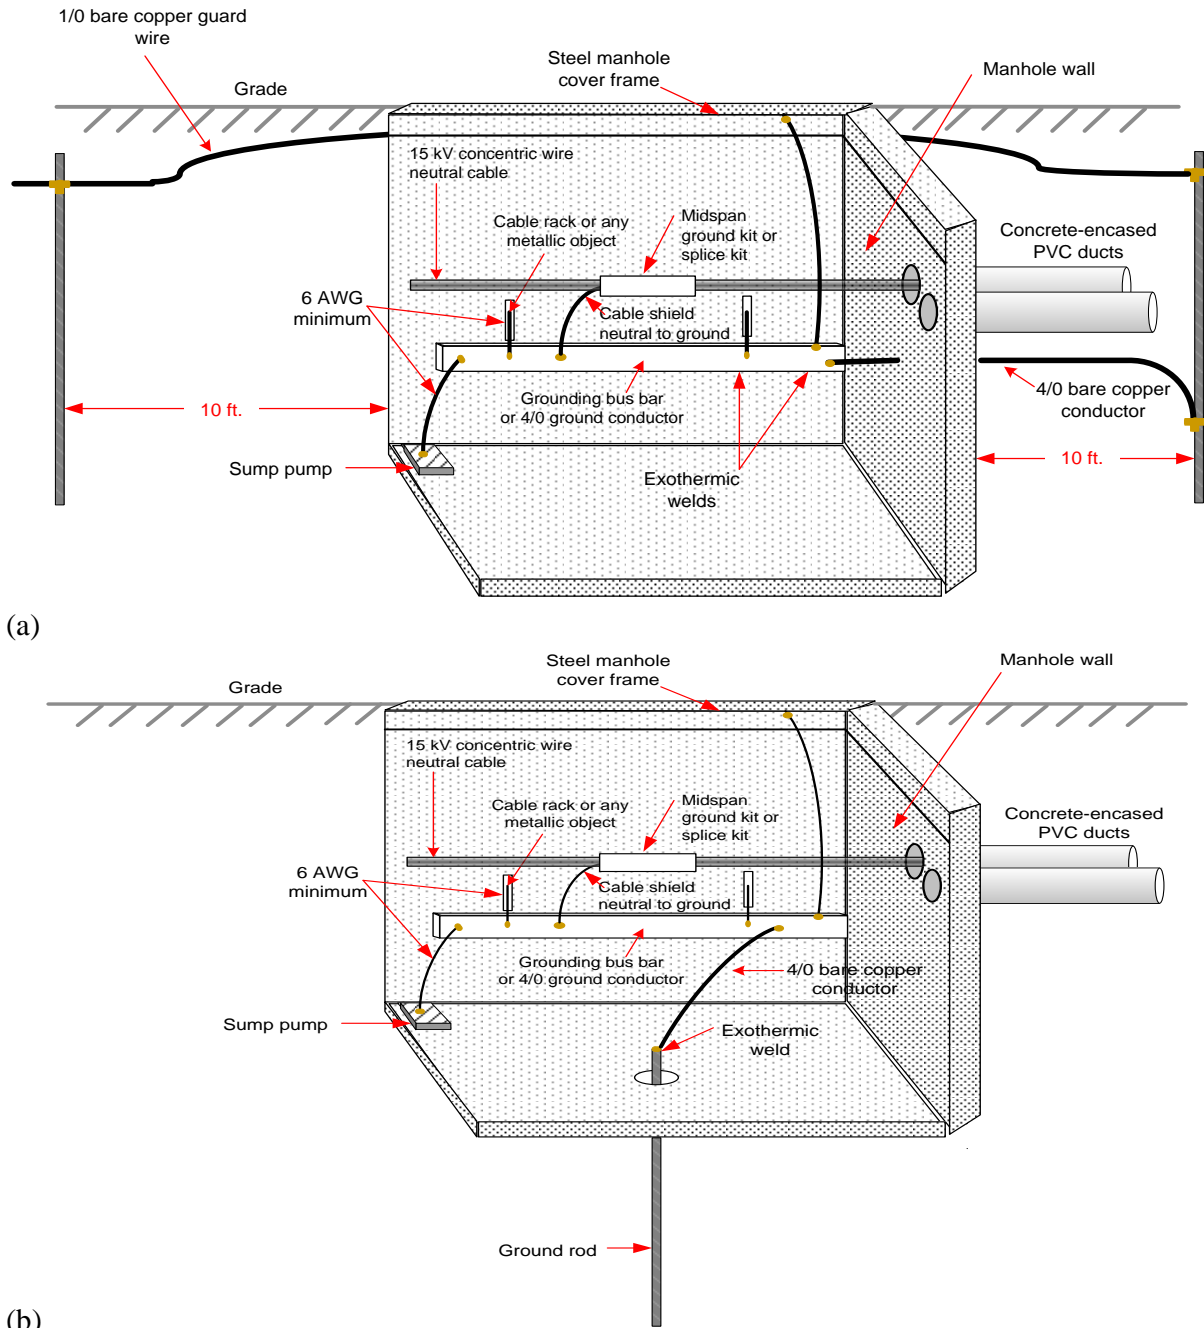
Grounding and guard wire installation detail for (a) manhole having a guard wire, and (b) manhole lacking a guard wire.
